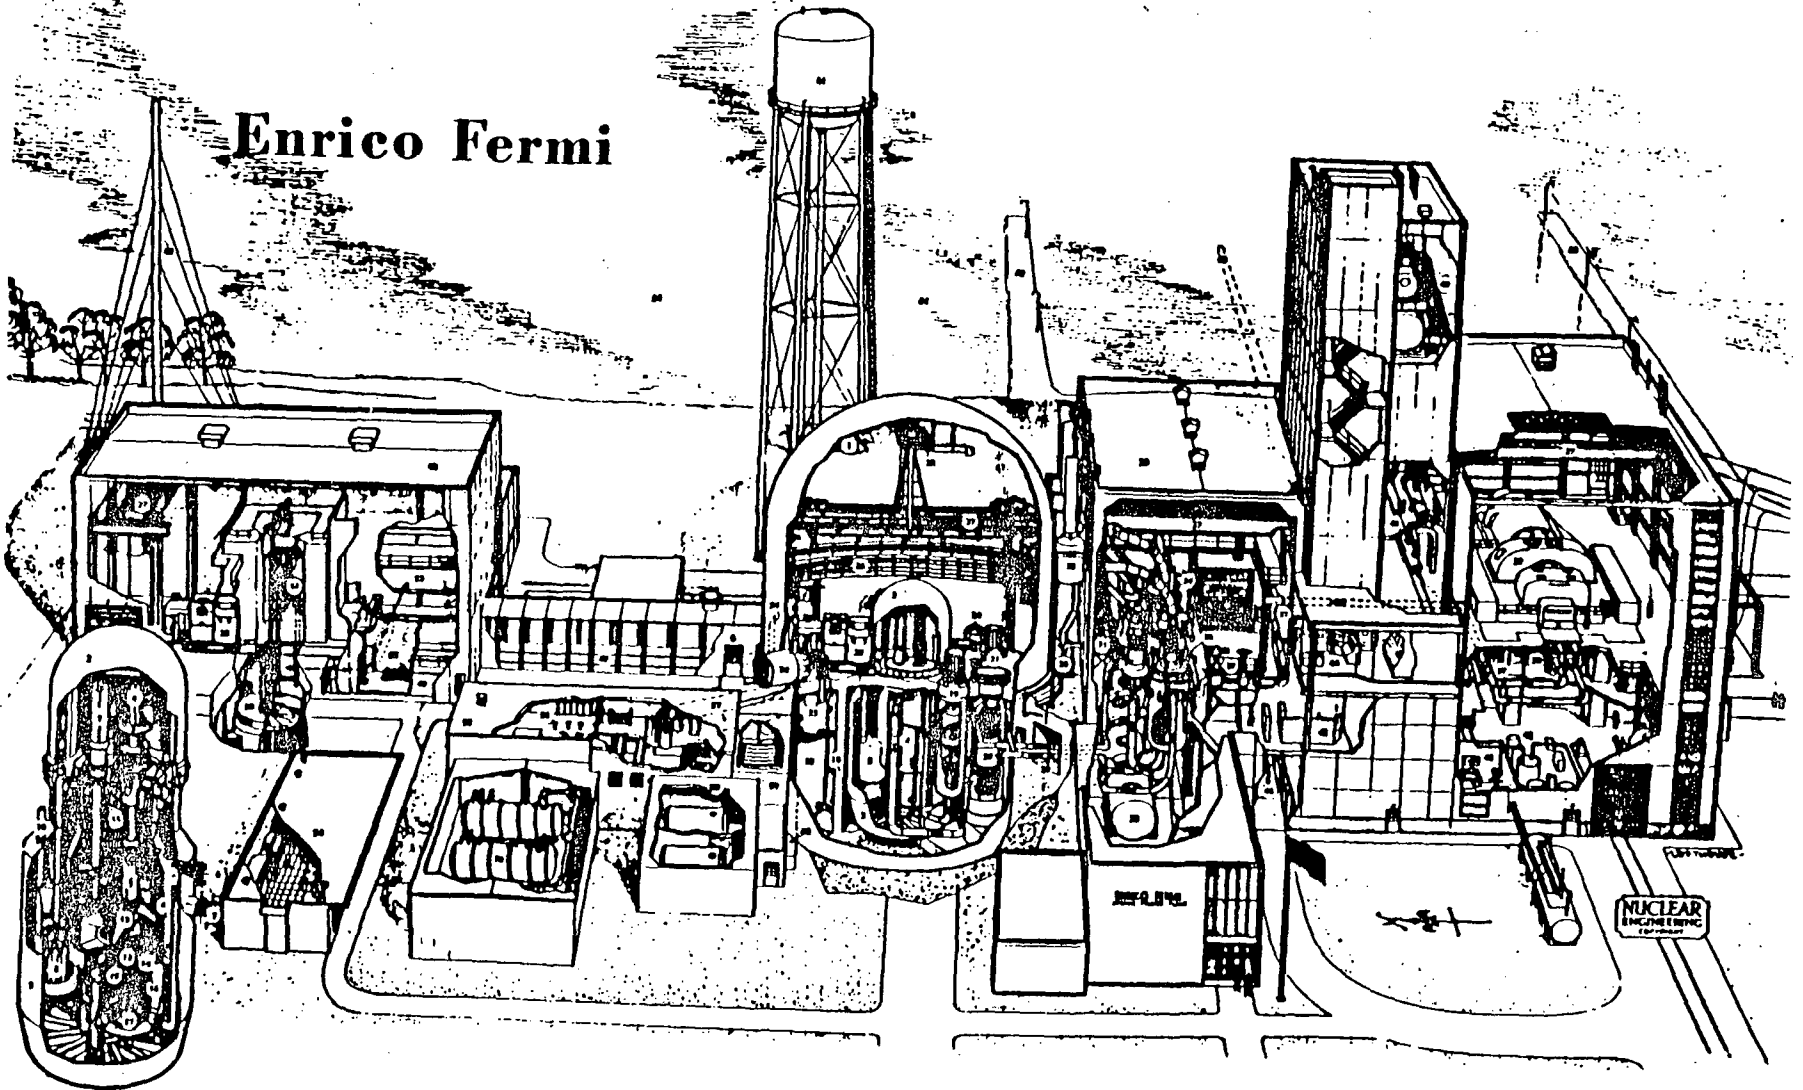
PLOT PLAN OF FERMI 1 PLANT SITE
